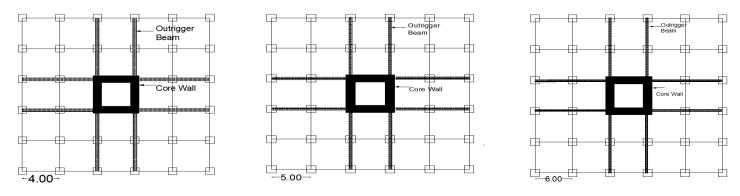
Building Plan 40-Storey	Figure 2 Building Plan 60-Storey	Figure 3 Building Plan 80-Storey
